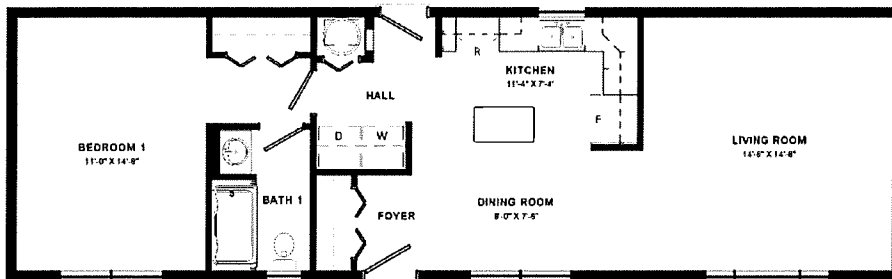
A typical floor plan of a single section home. Single section manufactured homes are structurally complete when they leave the factory. © Kent Homes (2019).
